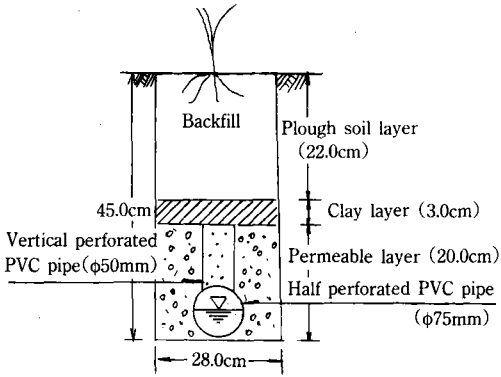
Cross-sectional view of installation of perforated PVC pipe
